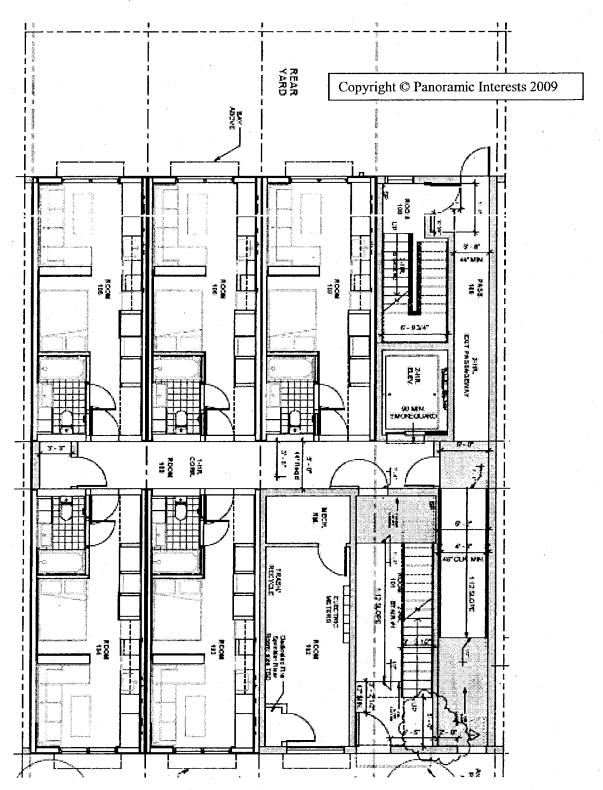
Ground Floor Plan 36-38 Harriet Street
